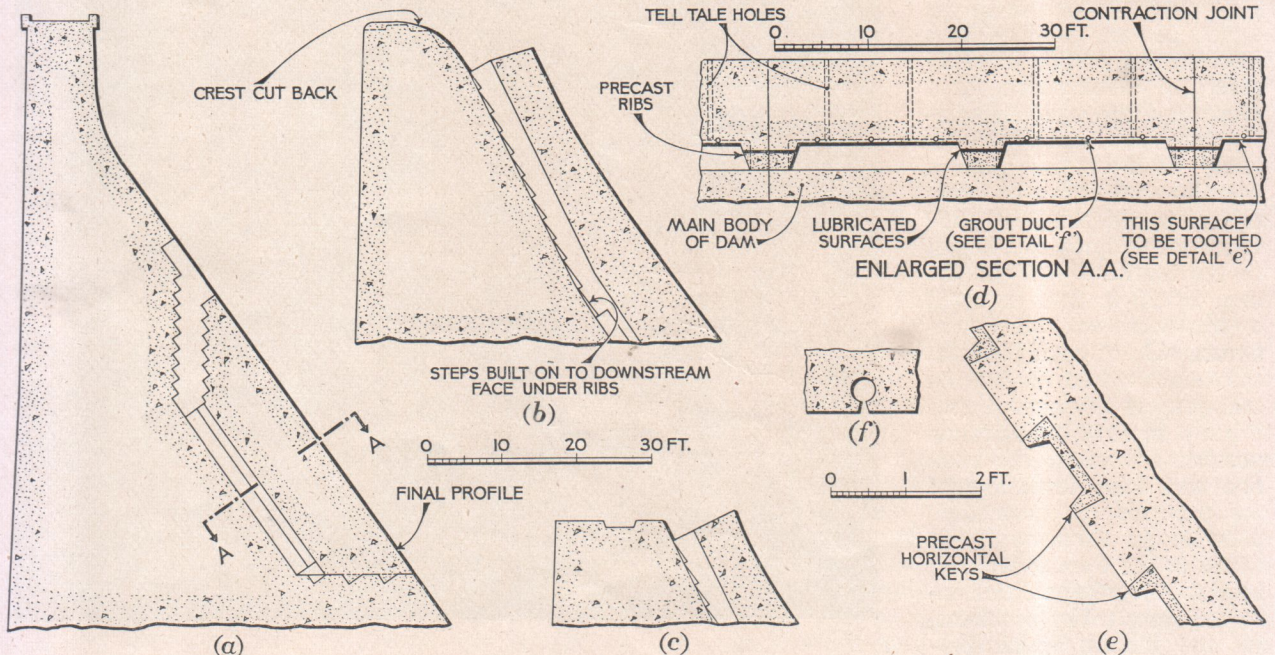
Details of the construction adopted to raise the height of the dam by 20 ft. while under construction
